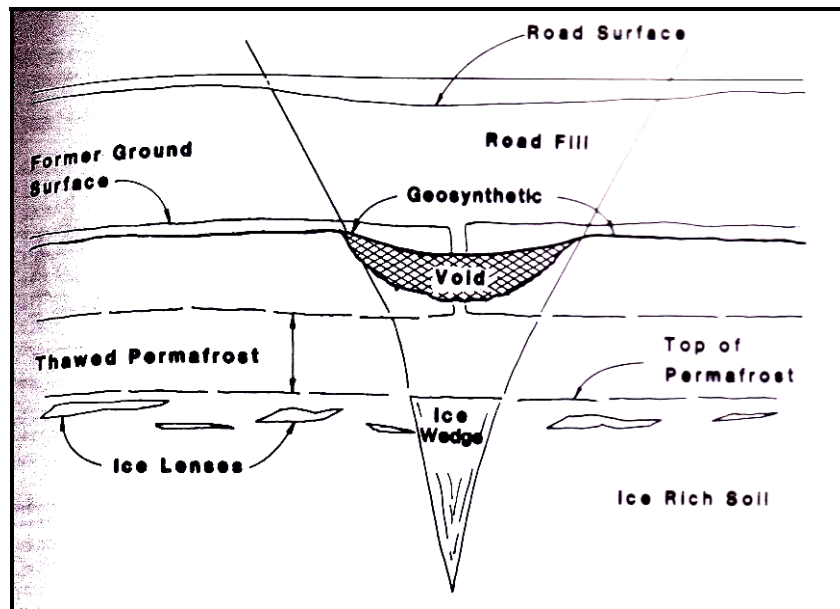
Geotextile bridging an ice-wedge (Rooney and Johnson, 1988)
